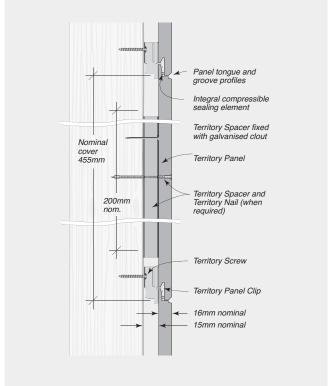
Typical Territory System Cross Section for Timber Framing for when face fixing is required – Elevation
